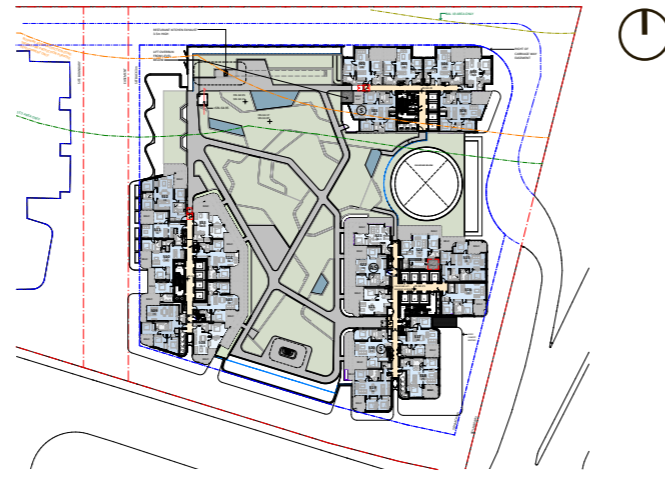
Meriton Trilogy_ Approved DA_ Typical Floor Plan
